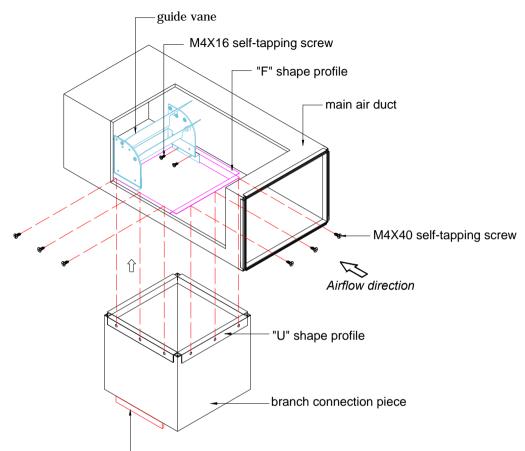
, Install adjustable guide vane. (refer to the installation sketch map of "adjustable guide vane cover")
